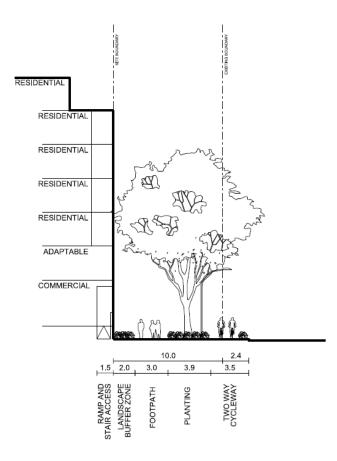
Section K - Landscaped Setback Typical Section (O'Dea Avenue)
